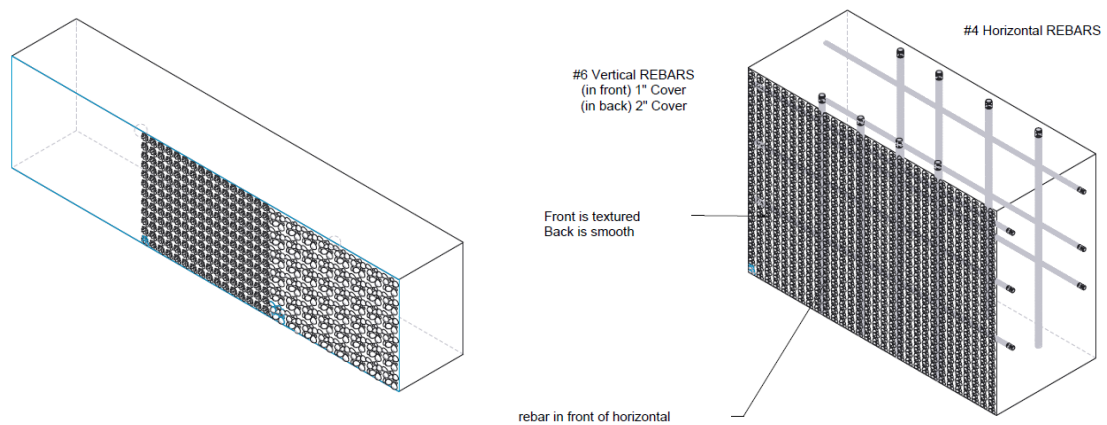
Concrete Beam (left) and Form (right) Design with varying surface textures and rebar
